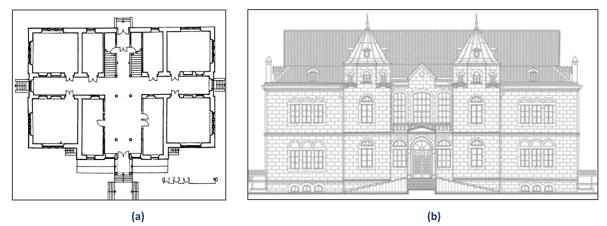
a) Sanayi Mektebi ground floor plan (Sözen, 1984) b) Sanayi Mektebi entrance facade (Çağlar, 2018)
